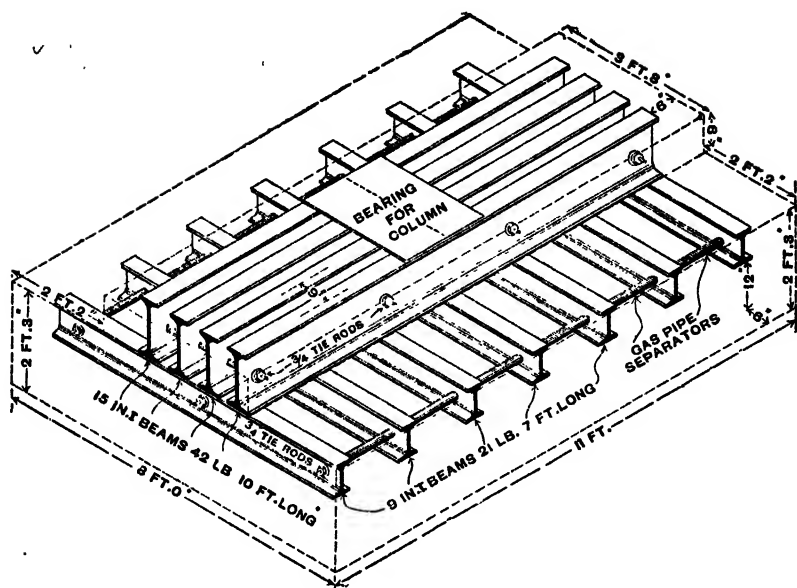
Concrete and I-beam Footing. (See p. 643.)
